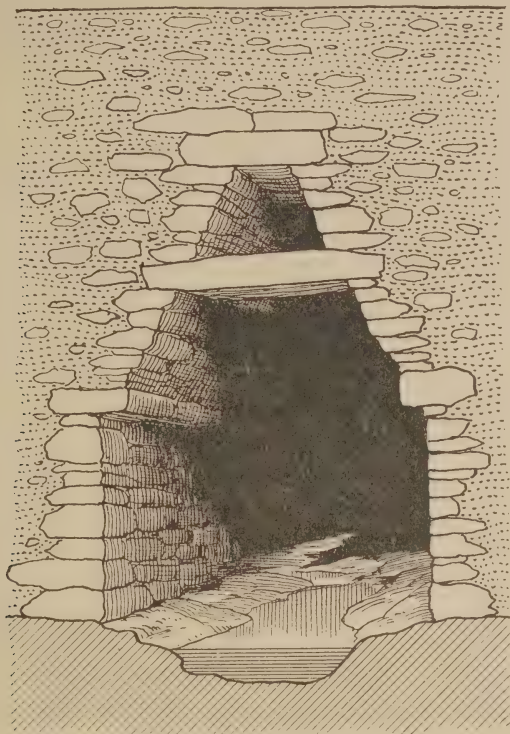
SECTION OF WATERWAY ARCH. HEIGHT 10 FEET.
